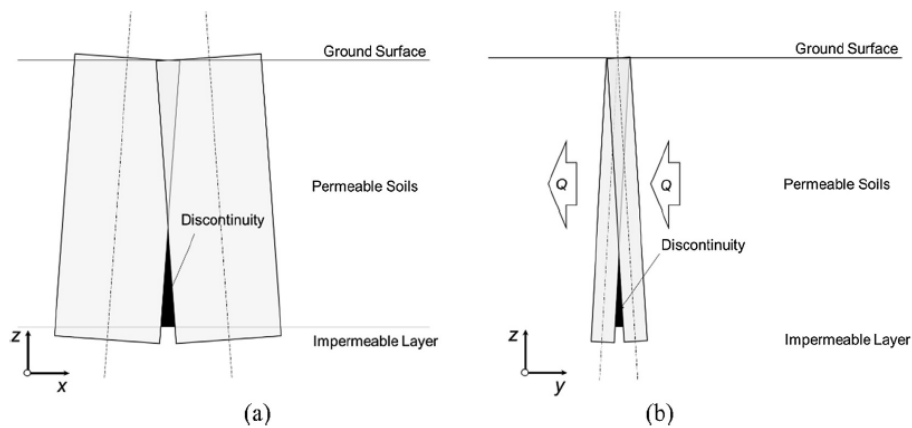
Possible seepage passages for insufficient panel connection, (a) deviation in the wall plane (x-z-plane); (b) deviation in the out of wall plane (y-z plane). (Pan and Fu, 2020)
